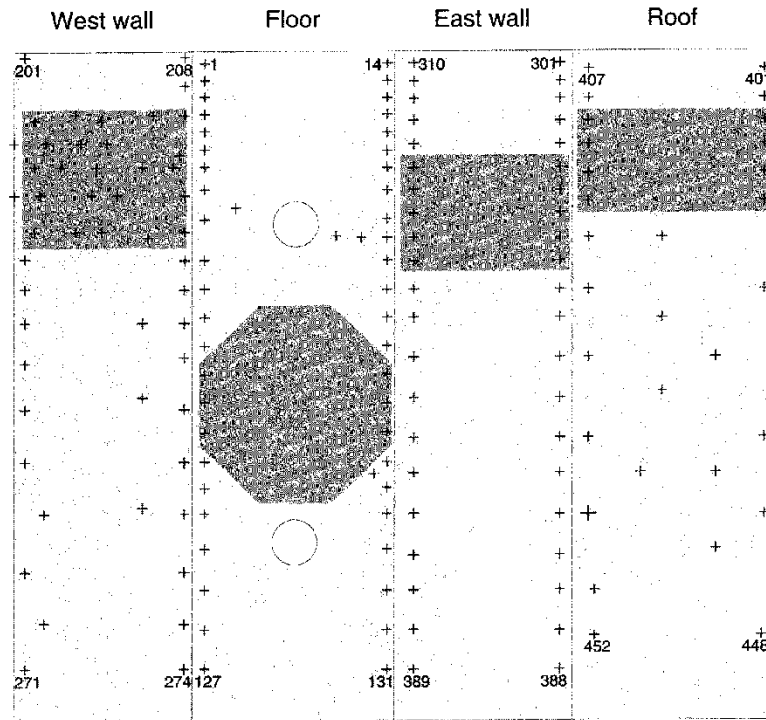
The pattern used for the grout holes and the areas in which detailed hydraulic conductivity measurements were made.
